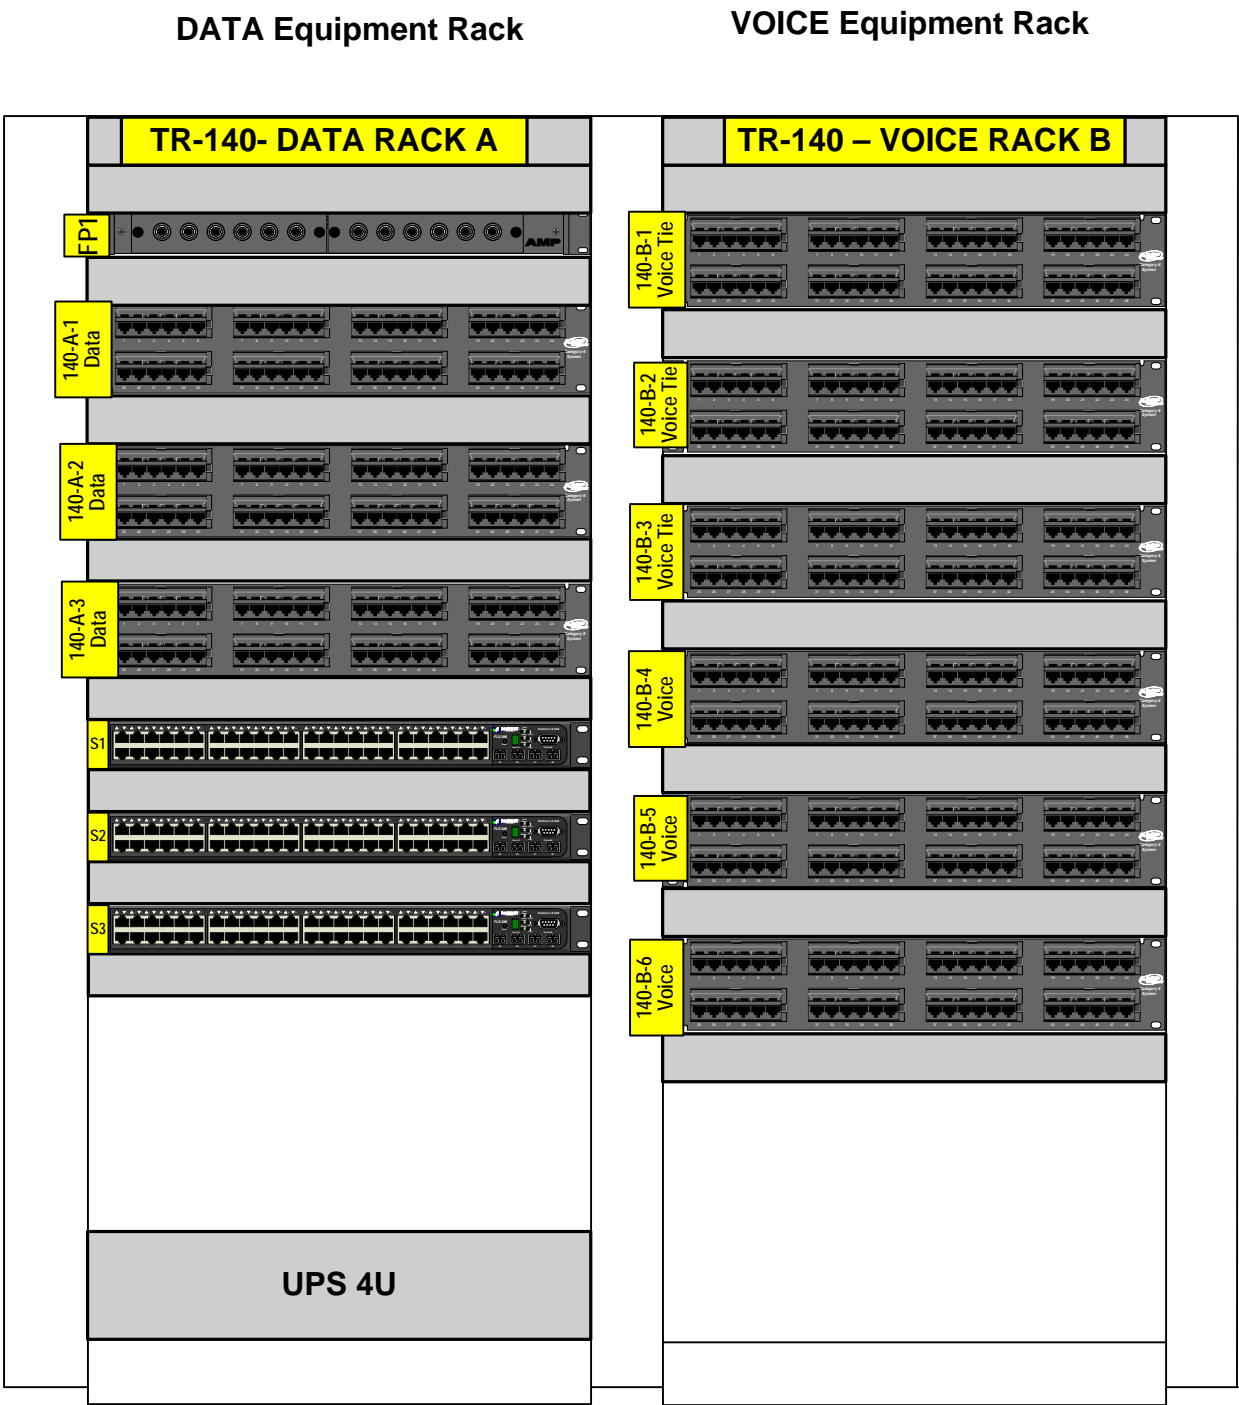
3: Communication Rack Elevation Labeling Examples – Typical
